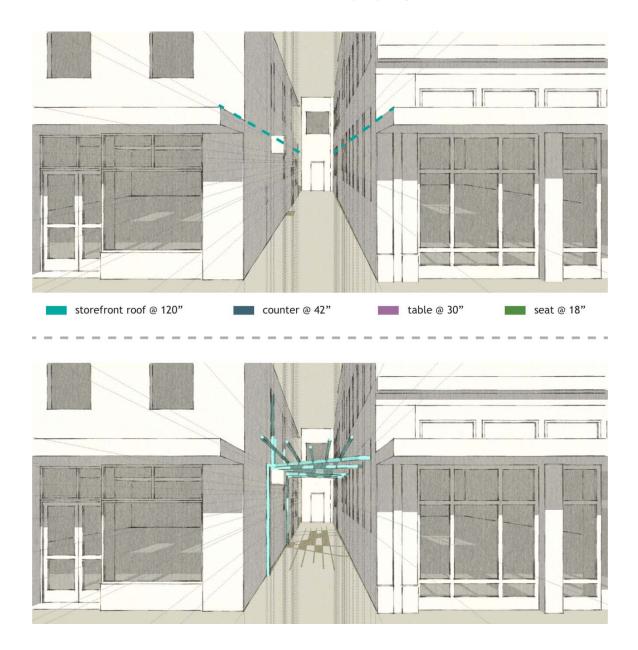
Utilizing the alley's facade to support a canopy installation
